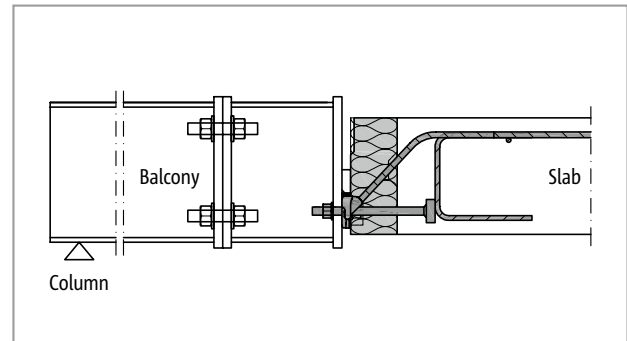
Schöck Isokorb® T type SQ: Steel stub adjuster between the Isokorb® and the balcony supports flexible construction workflows
